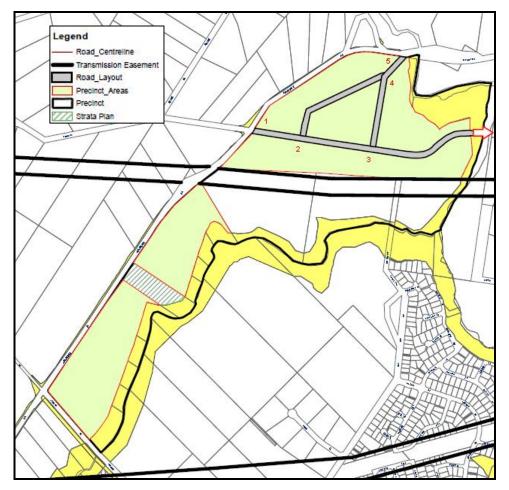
Master Plan – Proposed Road Layout Option 1
